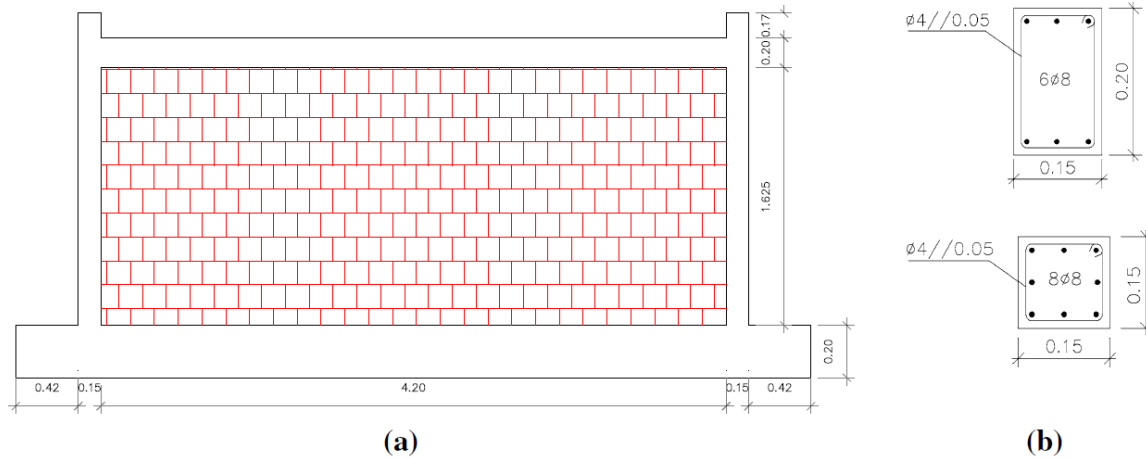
a) Single-story single-bay infilled masonry RC frame. b) Cross-section dimensions and detailing of RC beam and column (Vecchio and Emara, 1992).
